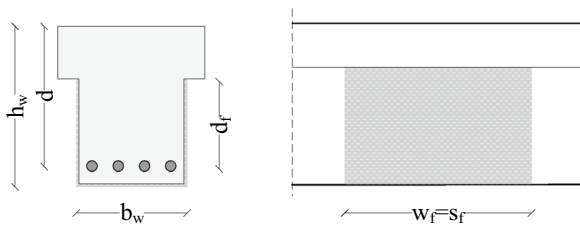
Dimensional variables in using EBR method using CFRP sheet
